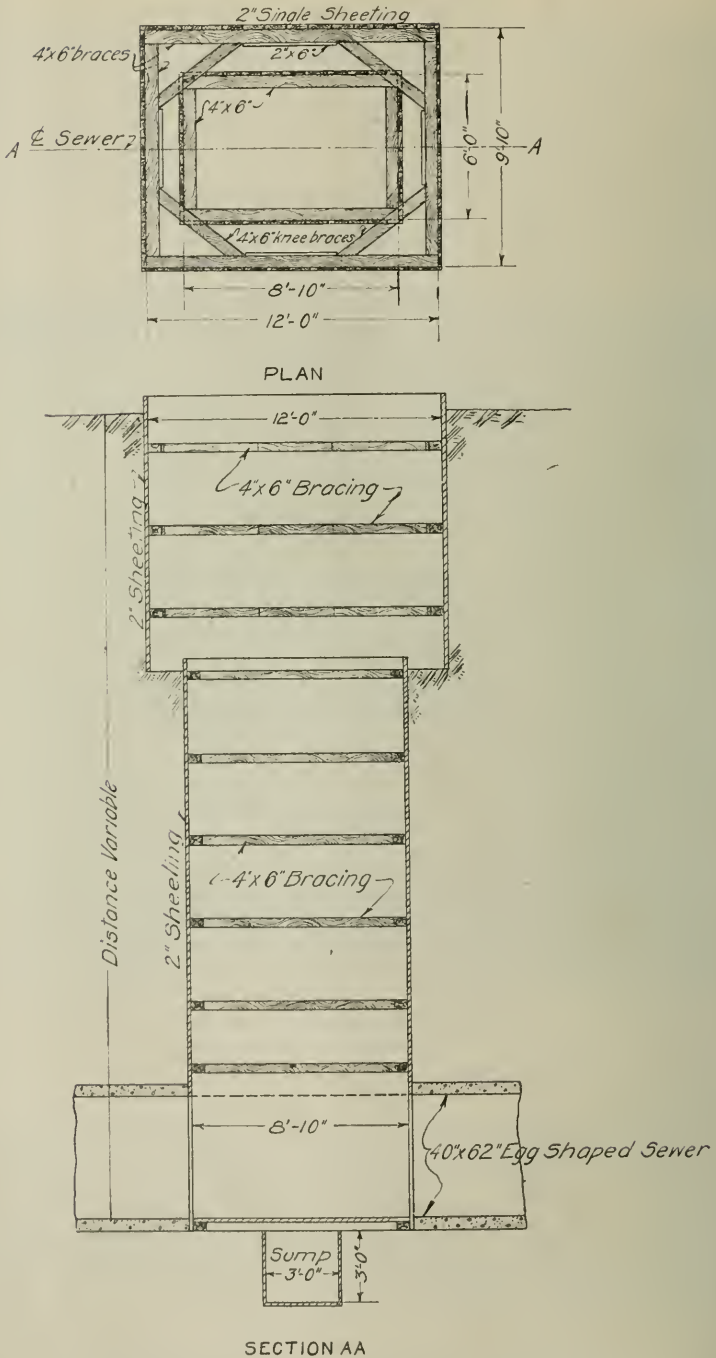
North Shore Sewer: Timbering Plan for Shafts on 40 in. by 62 in. Concrete and 24 in. Tile Sections—Contracts 2 and 3.
